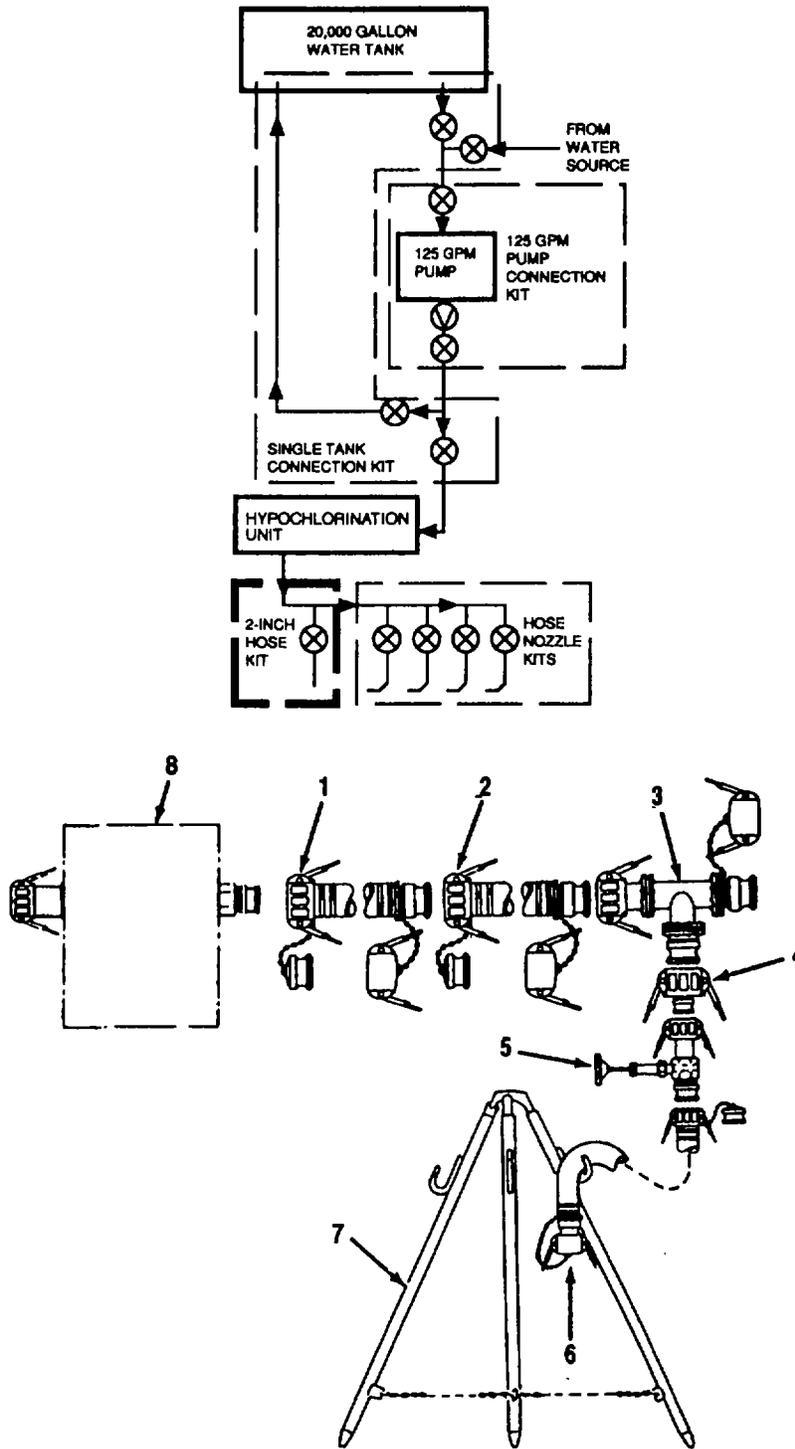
2-Inch Hose Connection Kit Assembly
